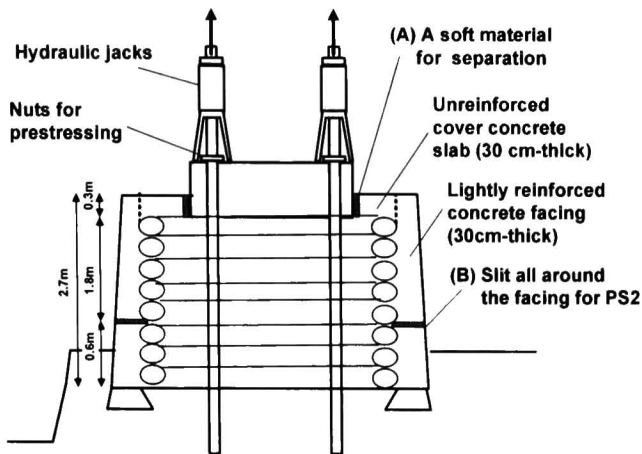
Set up of full-scale vertical loading tests PS1 and PS2 of the pier: The concrete facing did not exist at the preloading stage of construction
